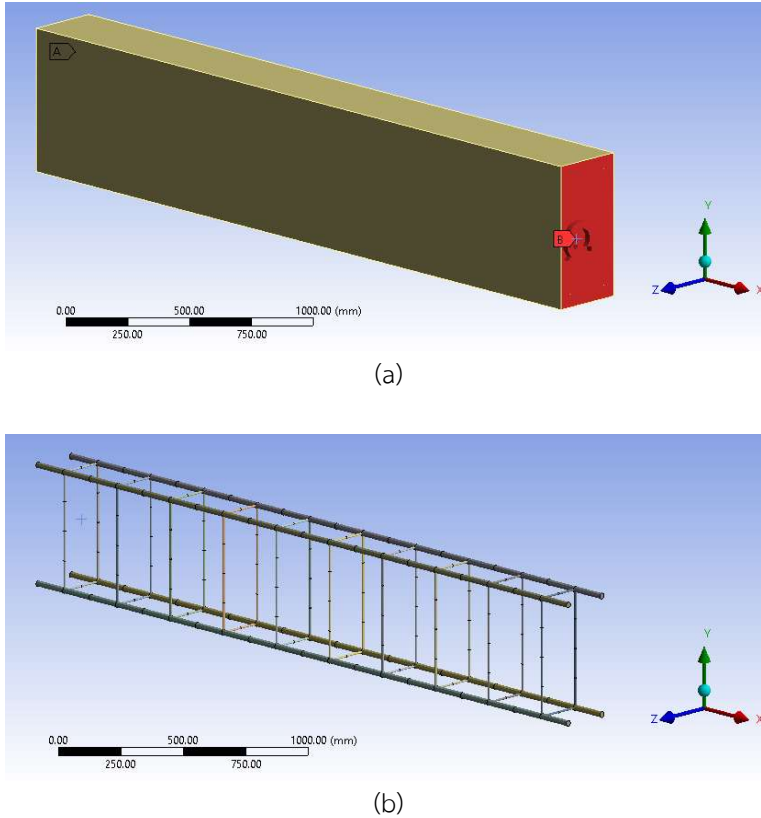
Finite element model for cantilever reinforced concrete beam: (a) RC beam and (b) stirrup and rebar.
